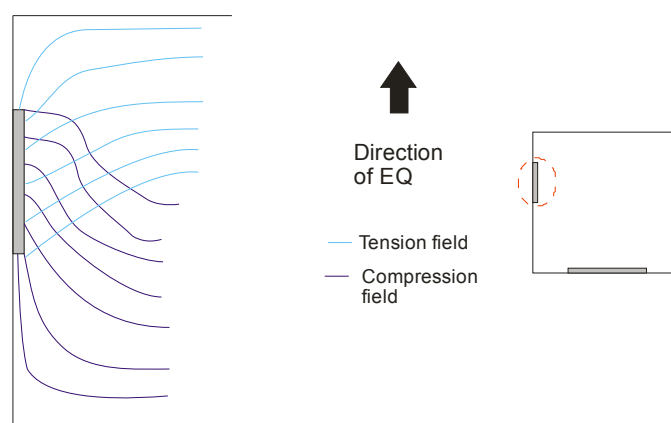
Compression and tension field at the 7m wall for floor layout 1
